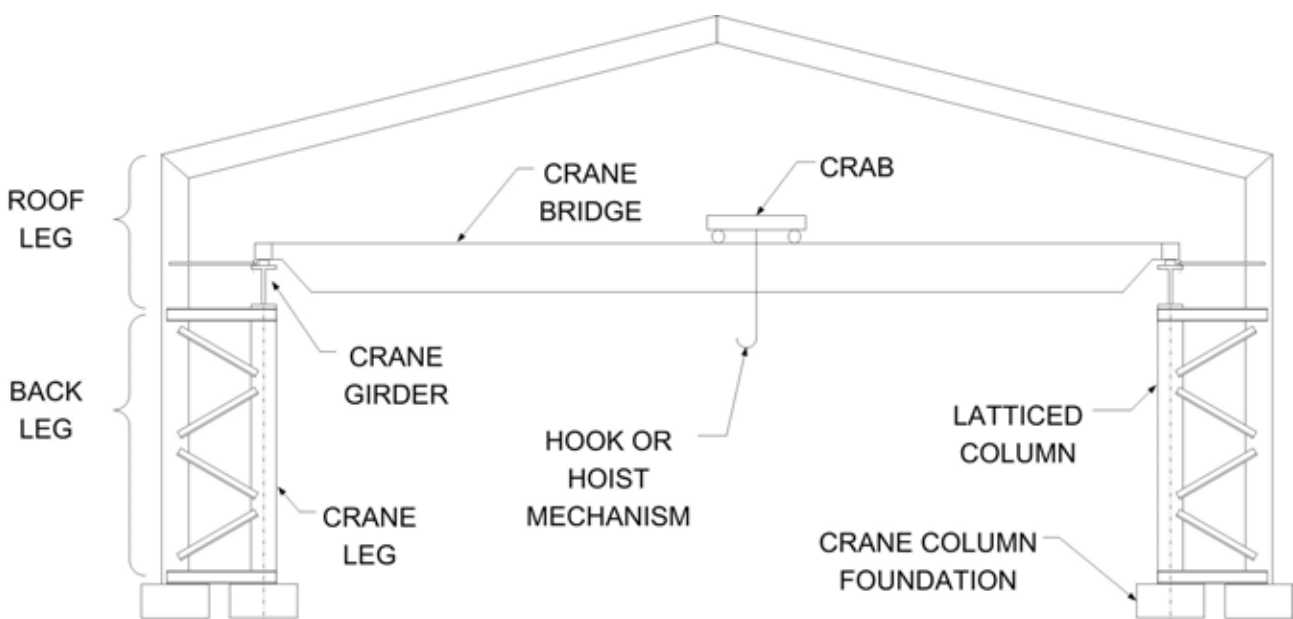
Heavy crane buildings often employ the latticed crane column.
